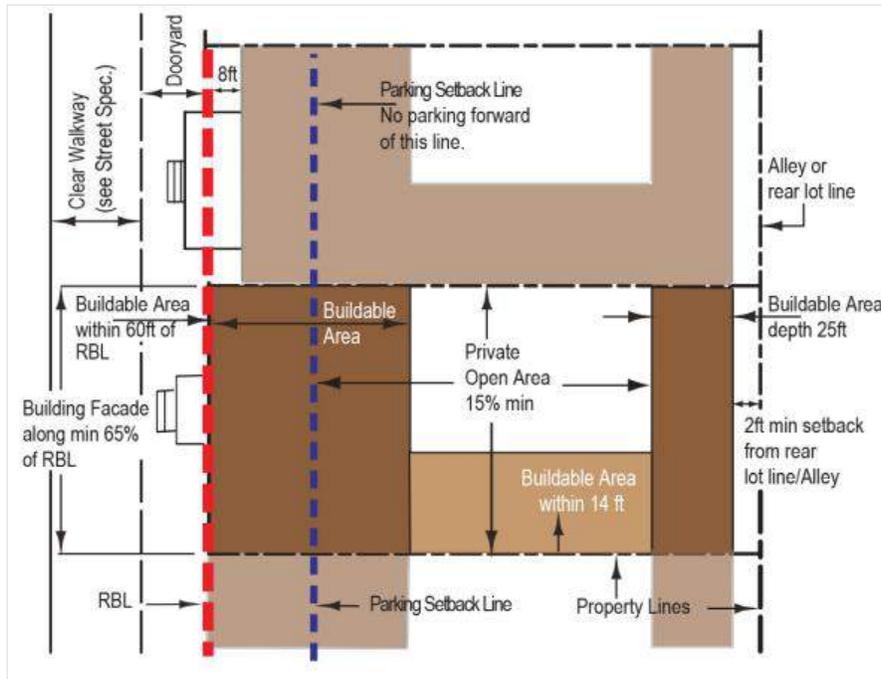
Townhouse/Small Apartment Siting Standards
